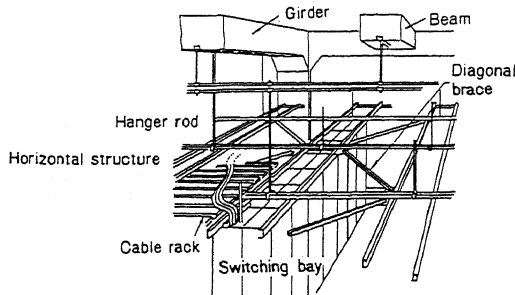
Outline of Equipment Supported by an Overhead Trussed Frame
